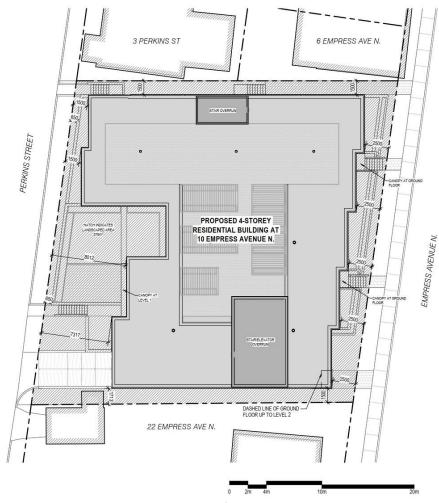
Site plan of 10-20 Empress Avenue.
